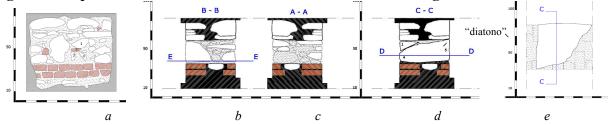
Inspection at First floor (HSP-I5-6): a) South facade of the masonry before disassembling; b) right vertical cross section; c) left vertical cross section; d) central vertical cross section considering the removed stones; e) D –D horizontal cross section showing the upper façade of the "diatono".
